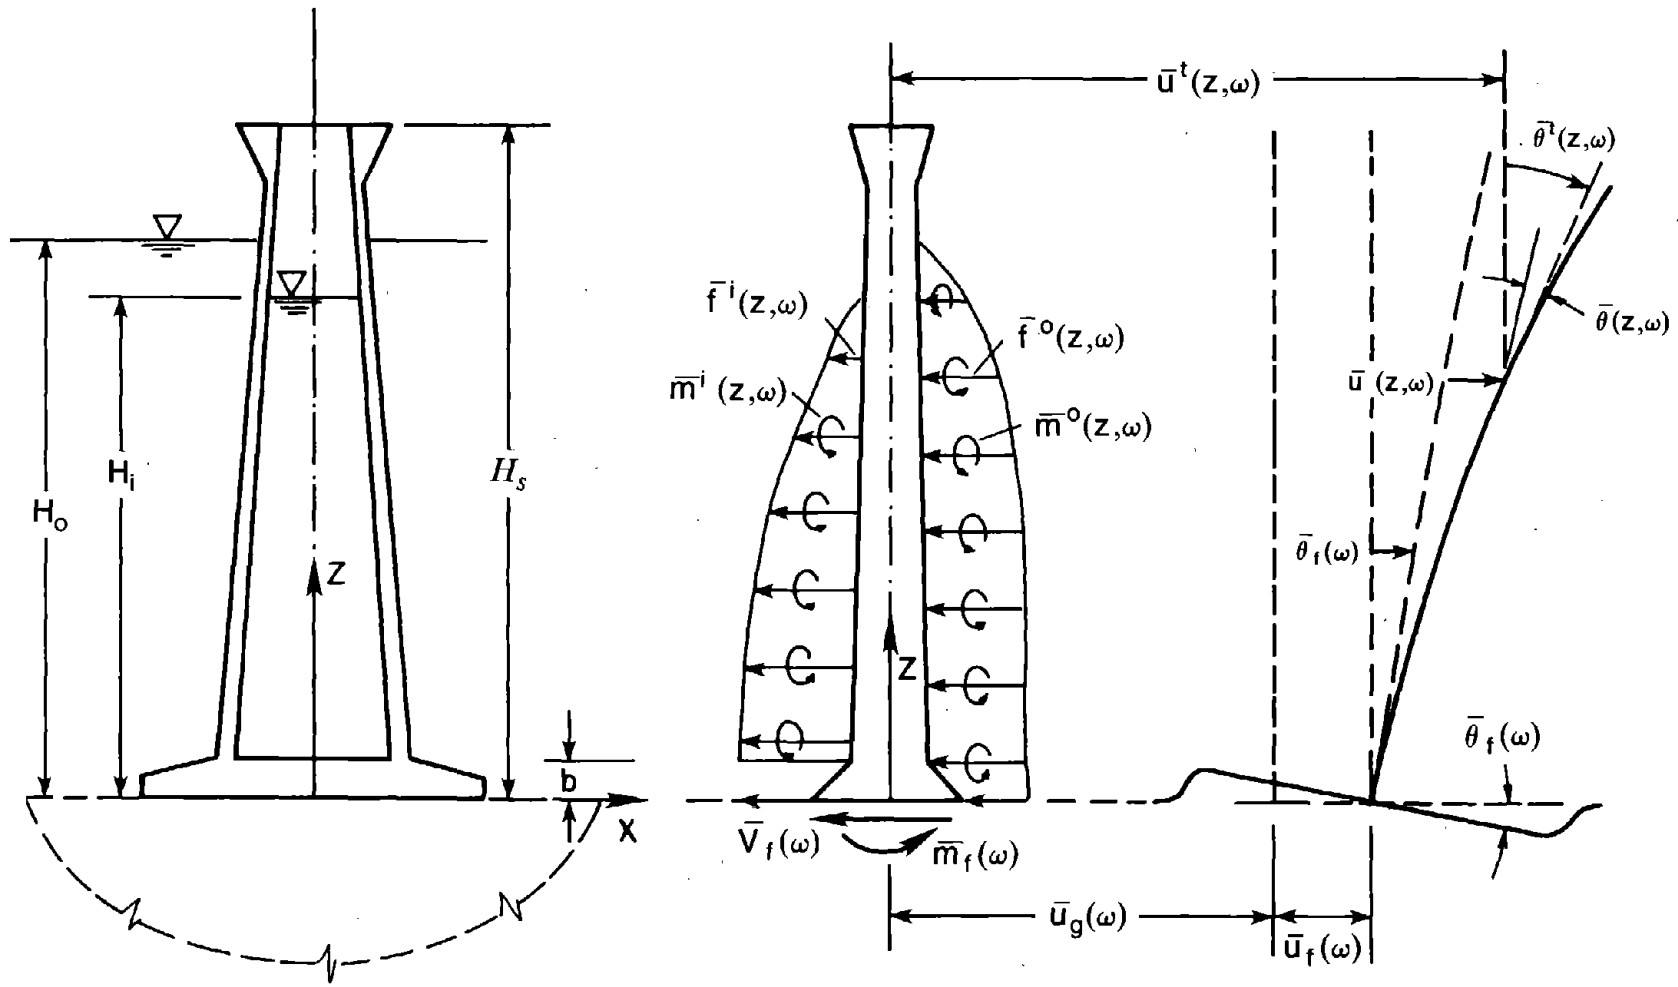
Substructure Representation of the Tower-Water-Foundation-Soil System
